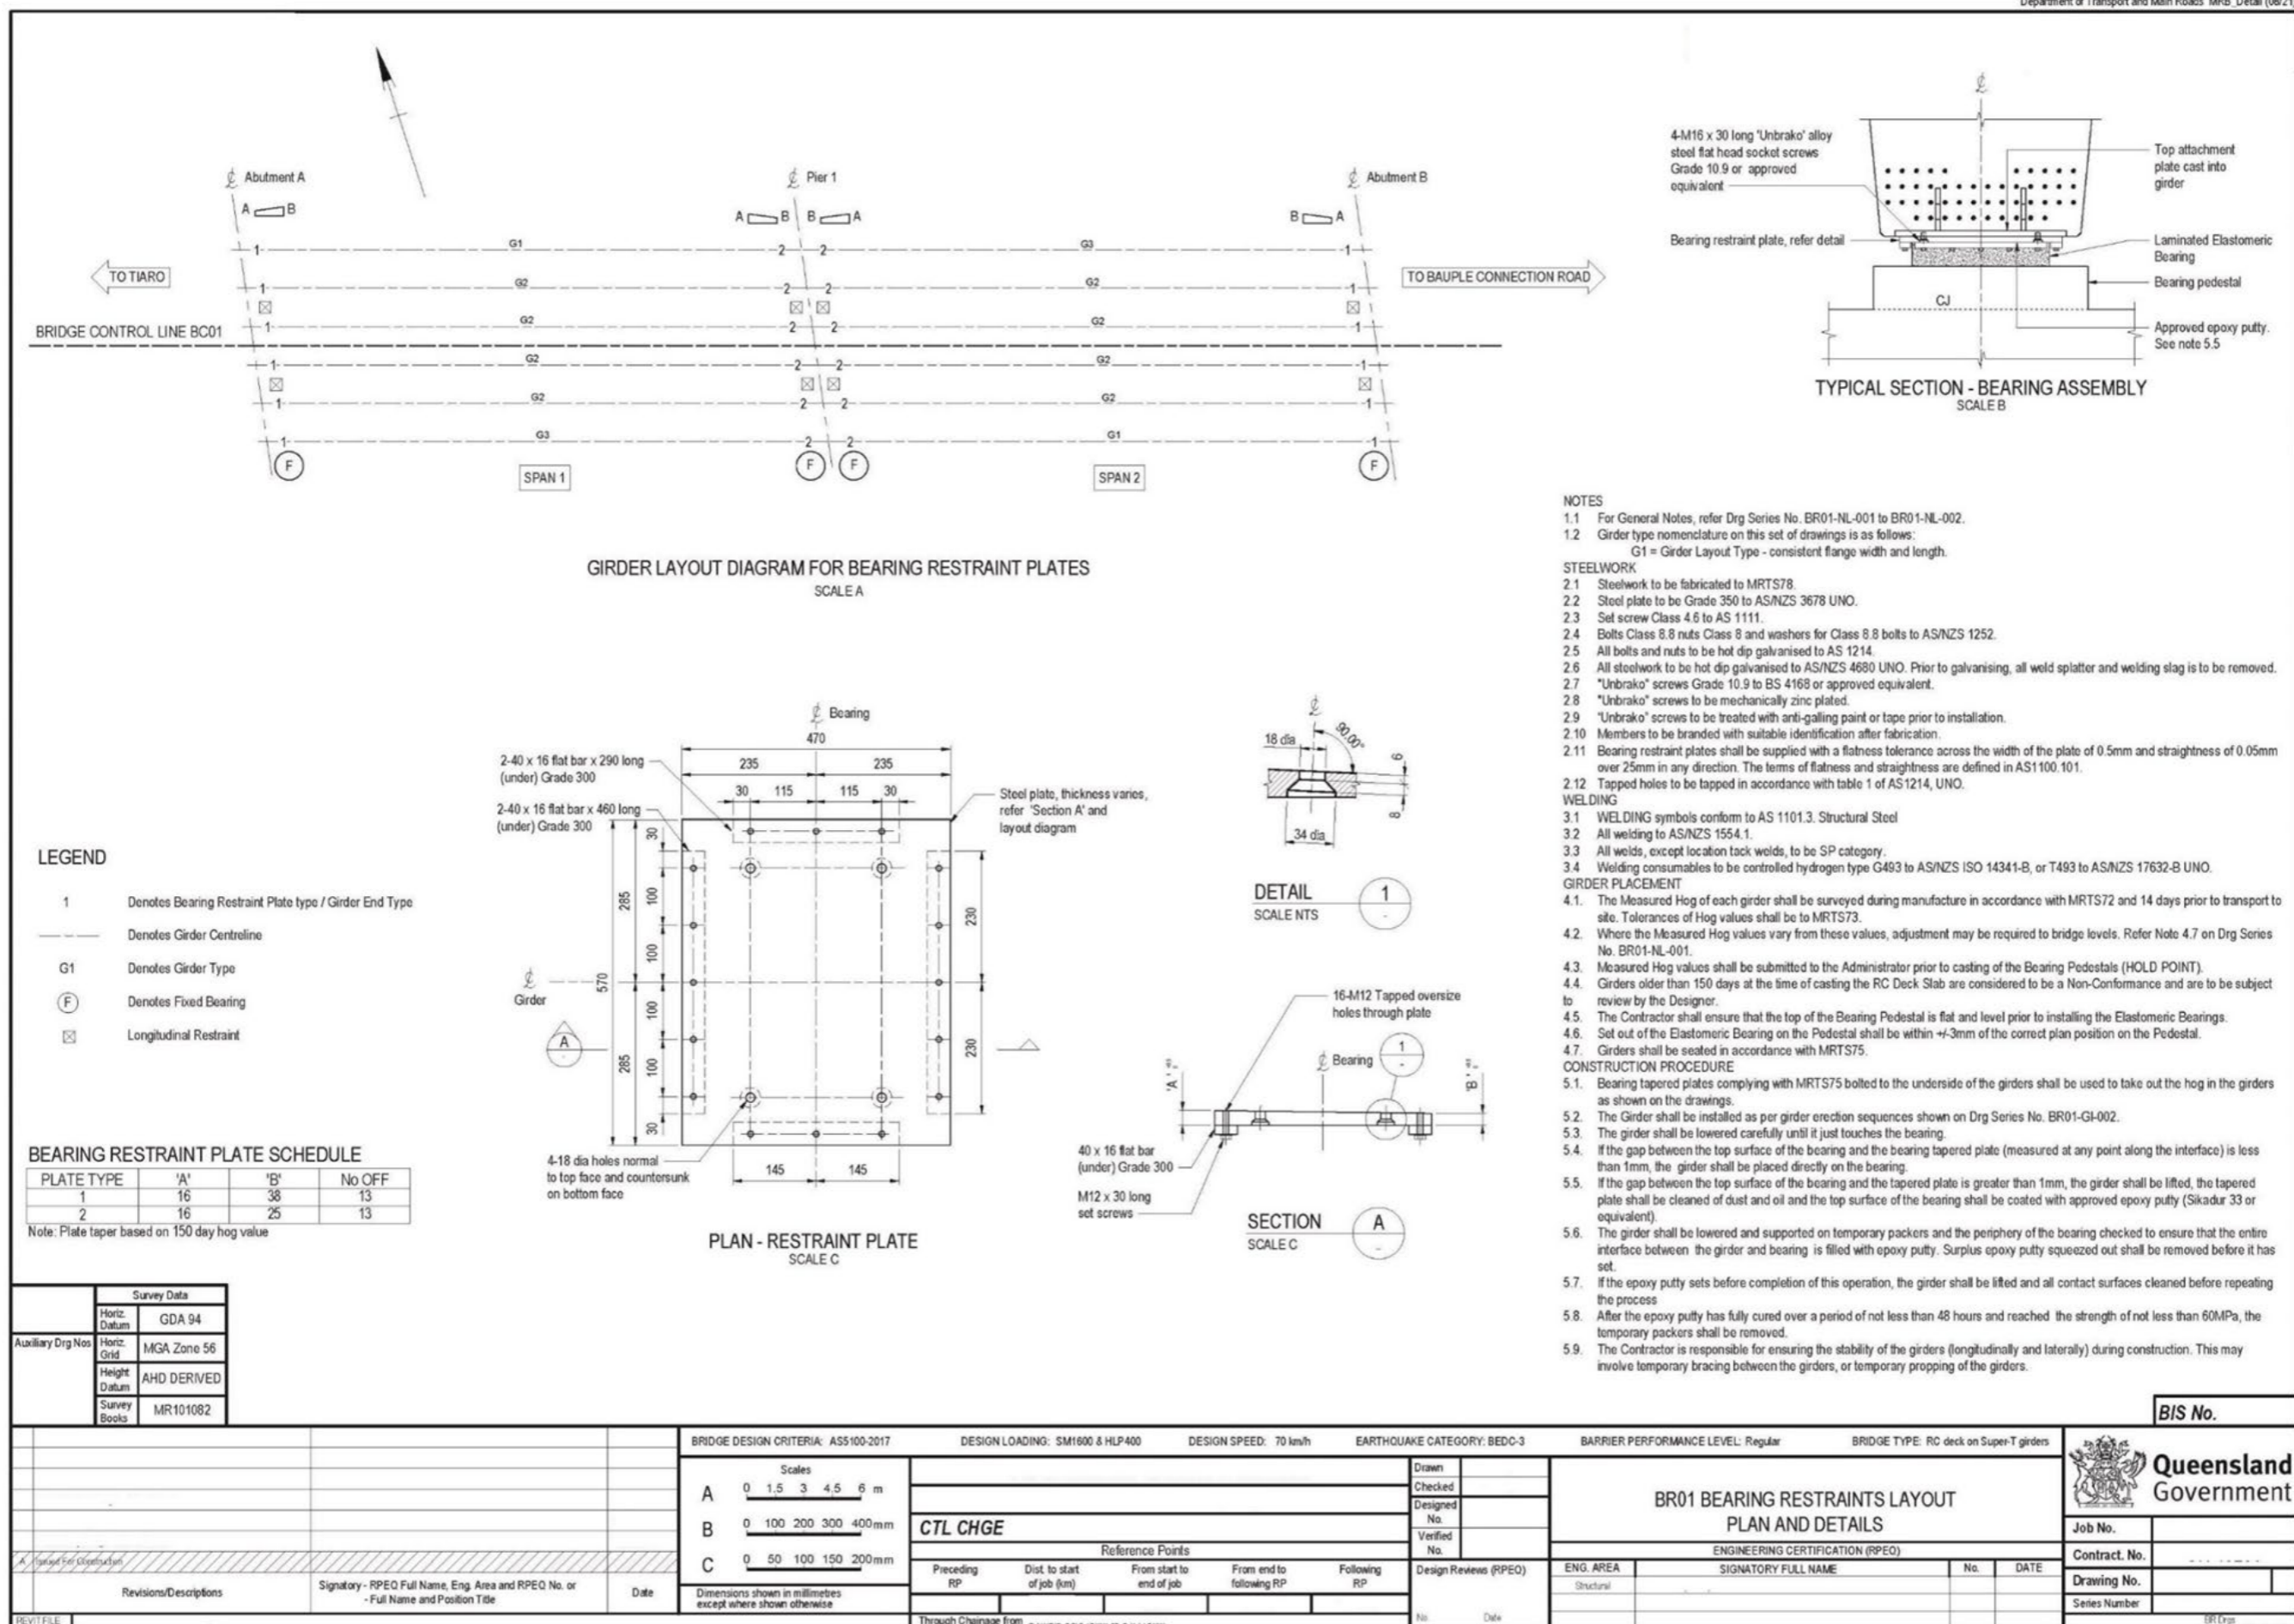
(b) - Example notes, details and schedules for Super-T girder bridge drawings - Sheet 2
